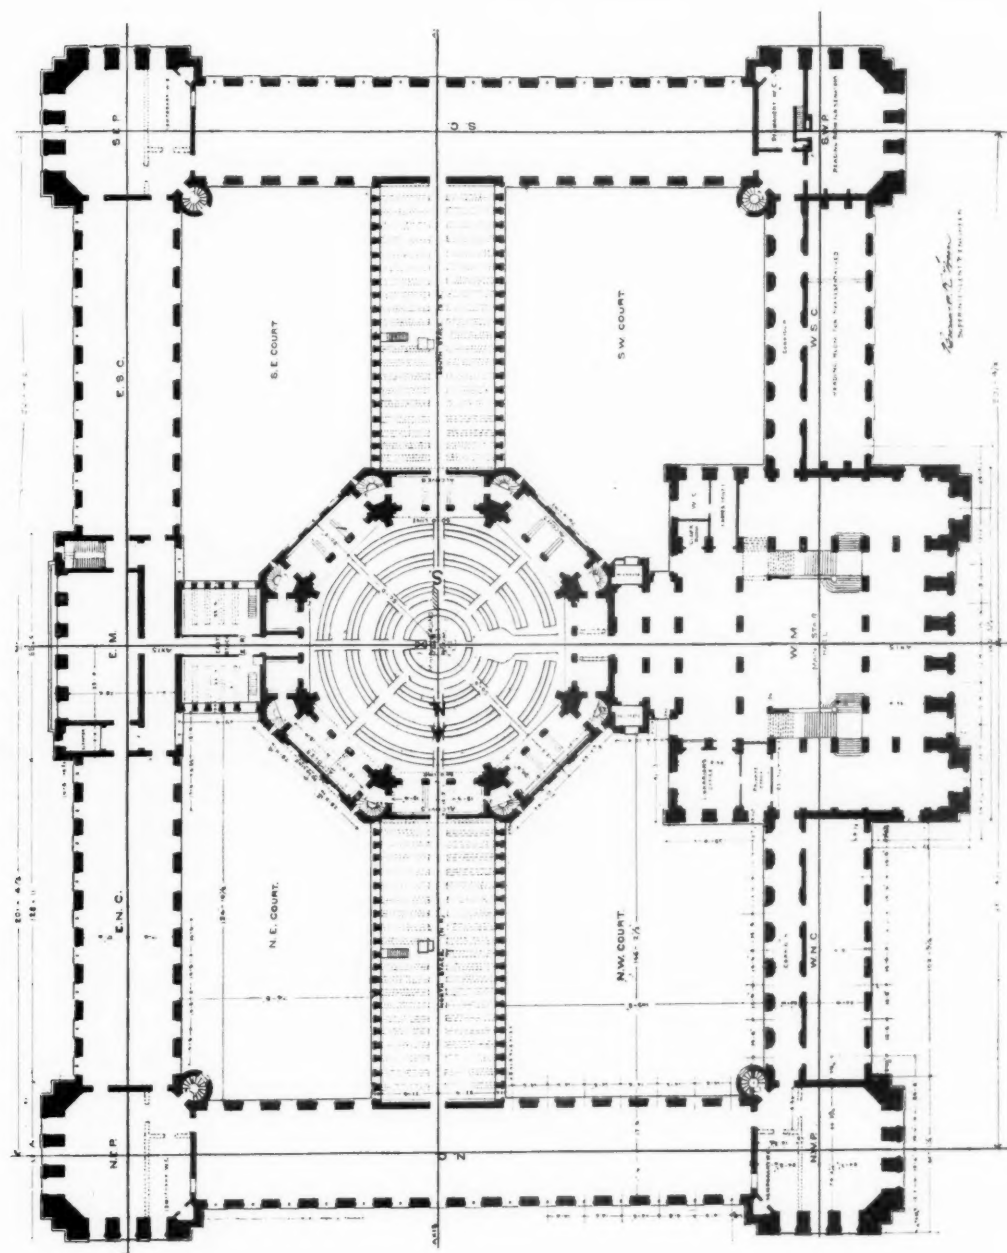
CONGRESSIONAL LIBRARY, WASHINGTON: GROUND FLOOR PLAN.
